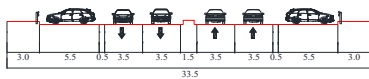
Typical cross section of New city Road (Secondary: Rural Area)
